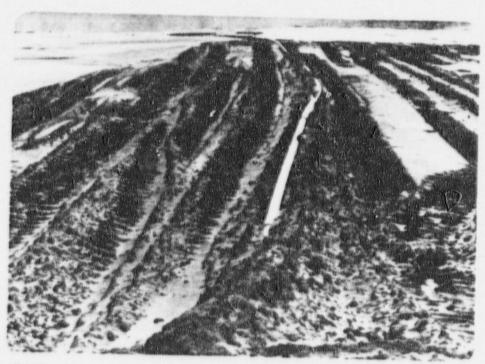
VIEW OF LINE FROM CREST TO RESERVOIR FROM CREST OF DAM LOOKING TOWARD POND AREA.
